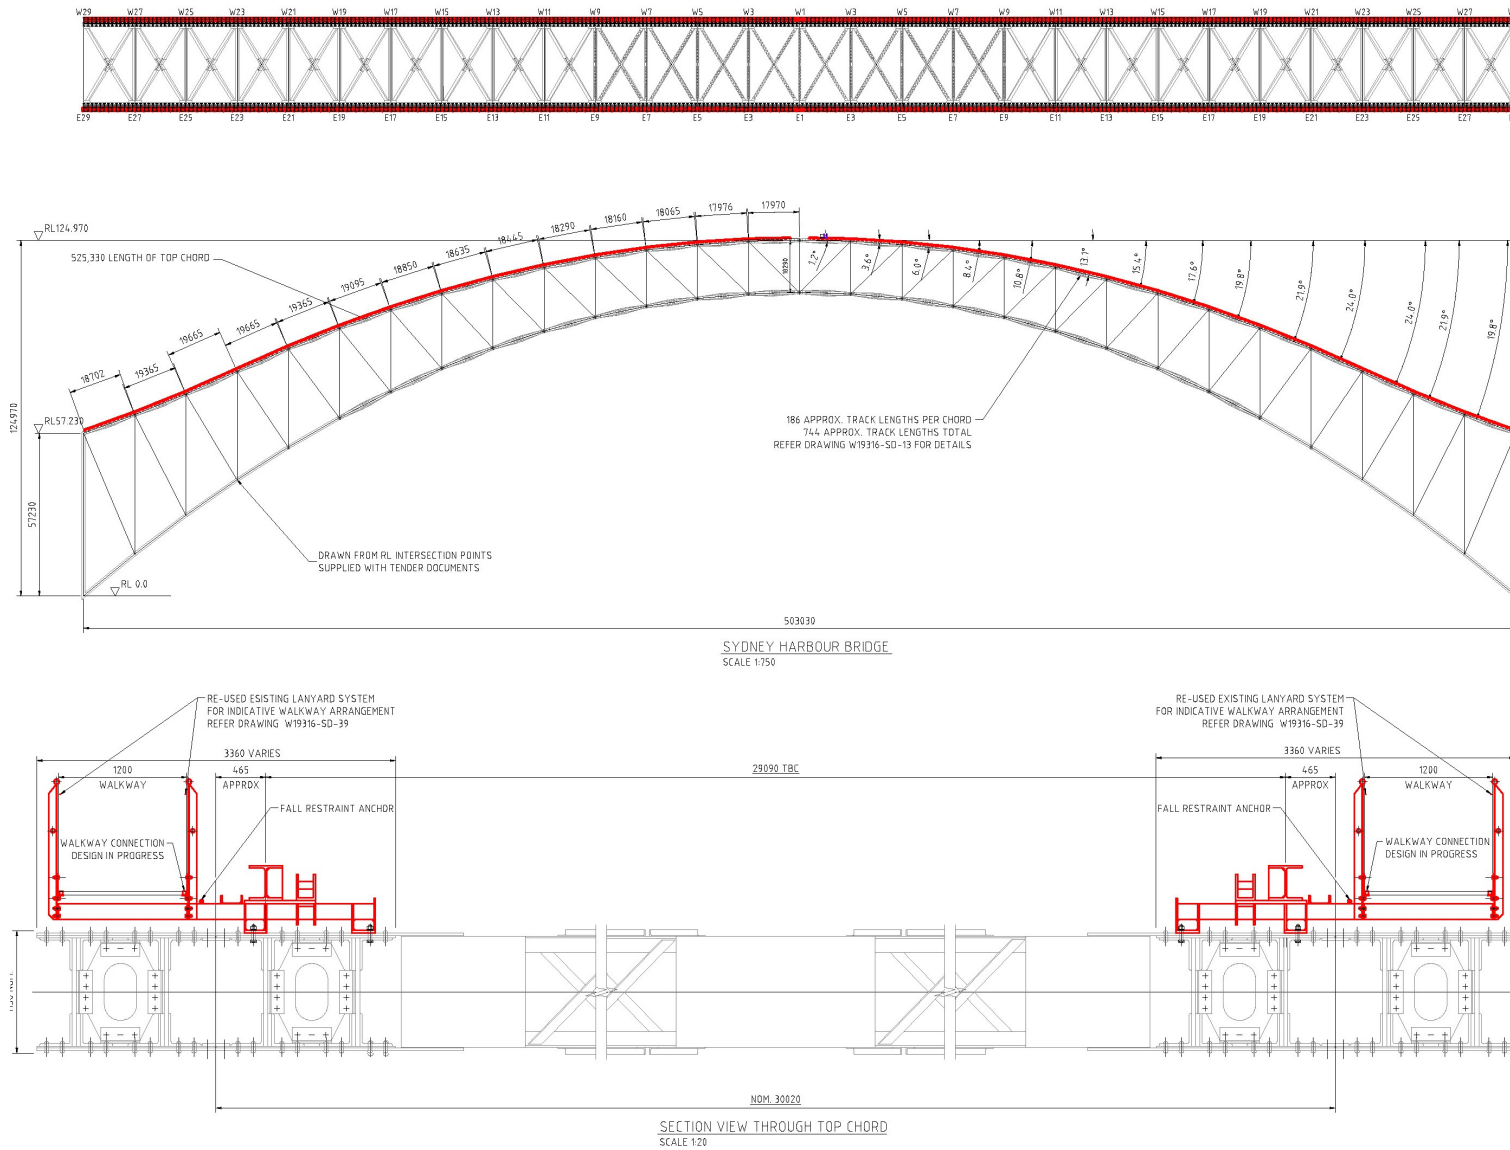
AMU plan and sections and indicative new walkways (Source: Mannetch)
